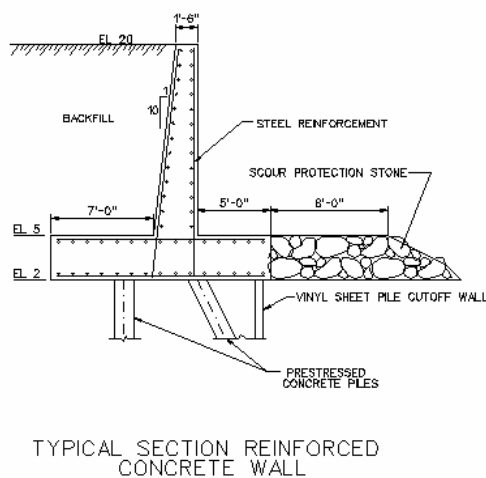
Typical Section of Inverted Reinforced Concrete T-Wall
